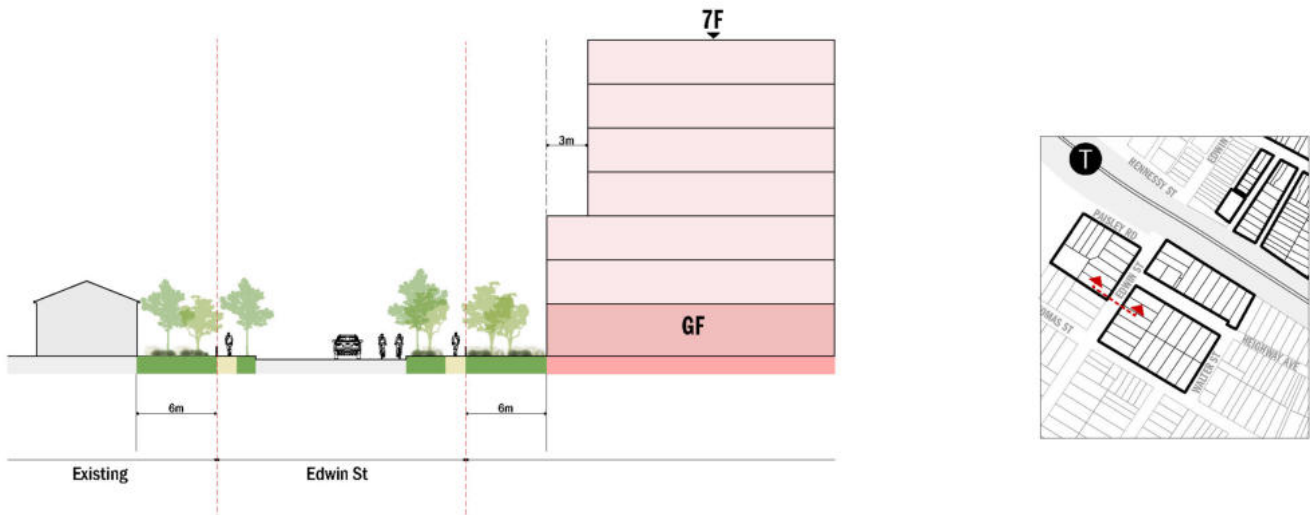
Croydon Centre South – Edwin Street south of Highway Avenue Section
